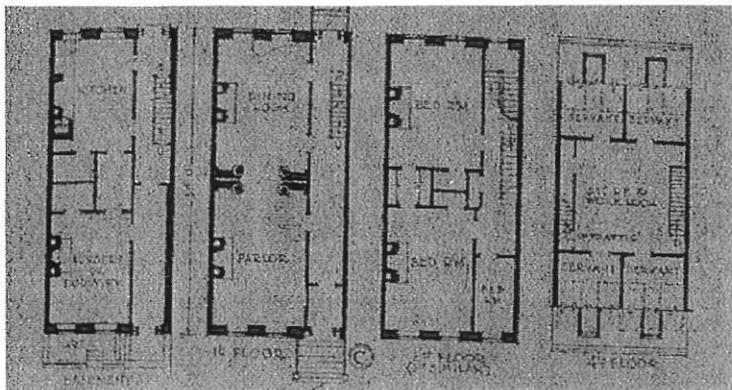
(A) AND (B) New York City Town House Floors Plans, c. 1830
